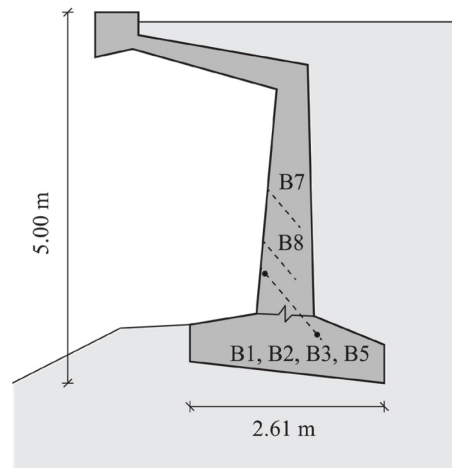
Cantilever retaining wall in Steinen, Switzerland, instrumented by Marmota Engineering AG [4]. The location of the drilled holes is only indicative and not to scale. For more precise details, see [4].
